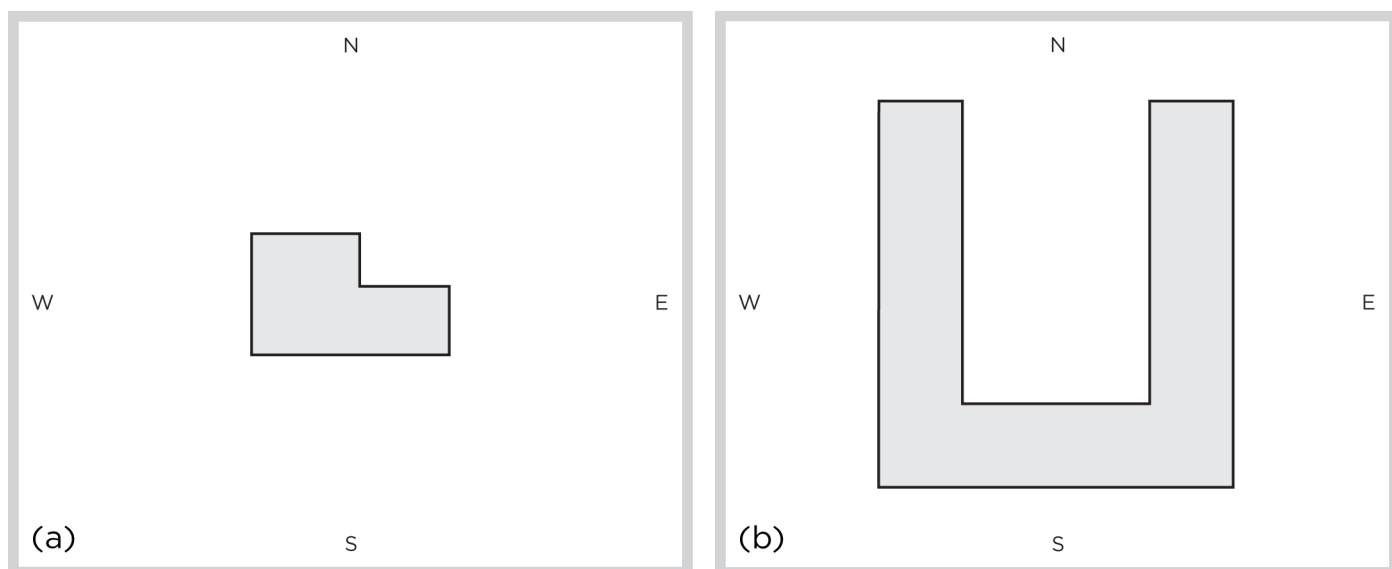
Sample footprints for (a) L-shaped building and (b) U-shaped building.
